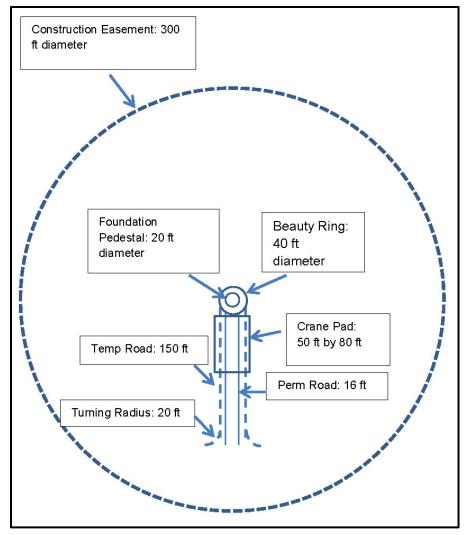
Wind turbine generator component staging dimensions for GE 2.3 and 2.5 machines. Note: dotted areas are temporary impacts.
